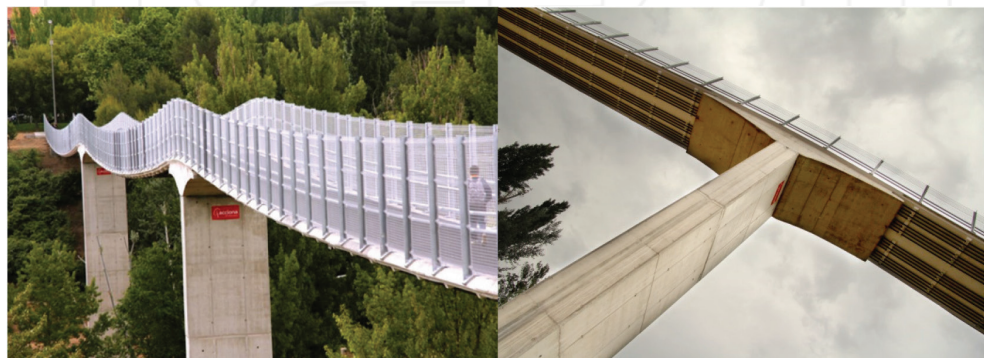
Left: Cuenca footbridge, Right: detail of the cables used.
